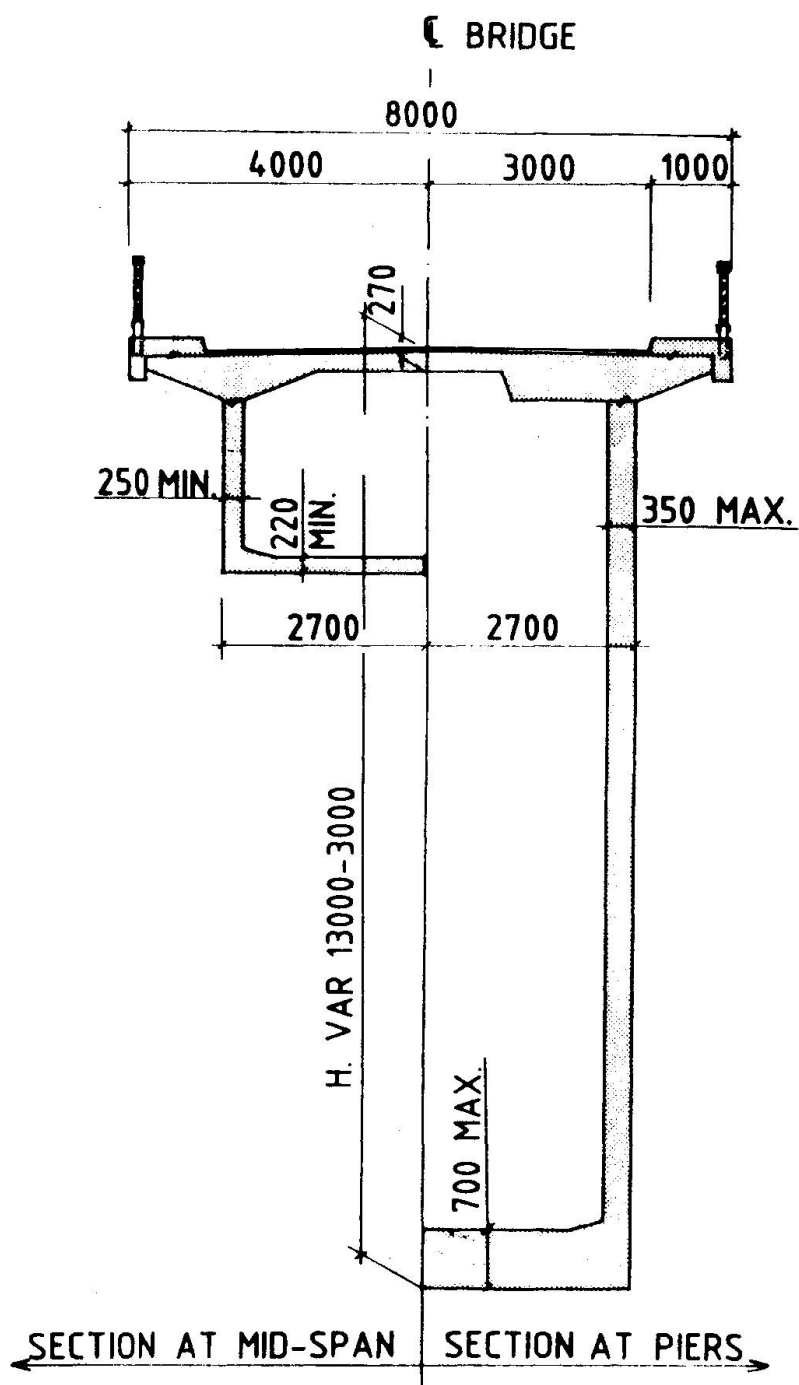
NORDDALSFJORD BRIDGE. SECTION
